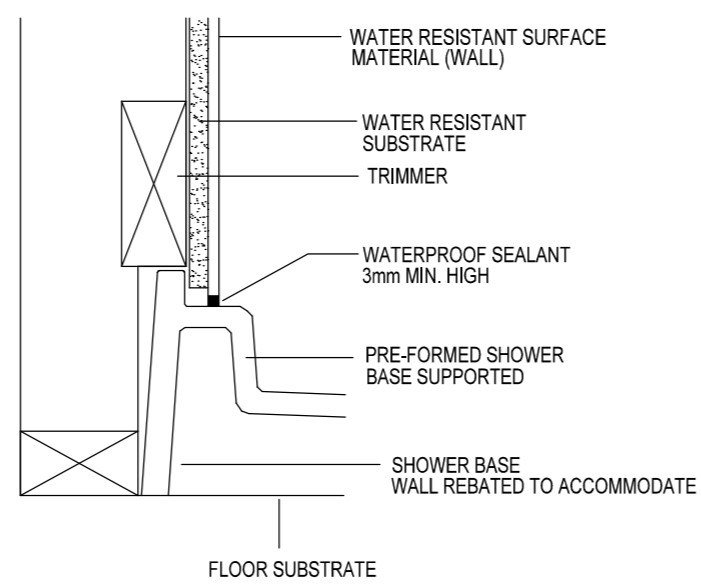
WATERPROOFING A SHOWER FLOOR USING SHOWER BASE
